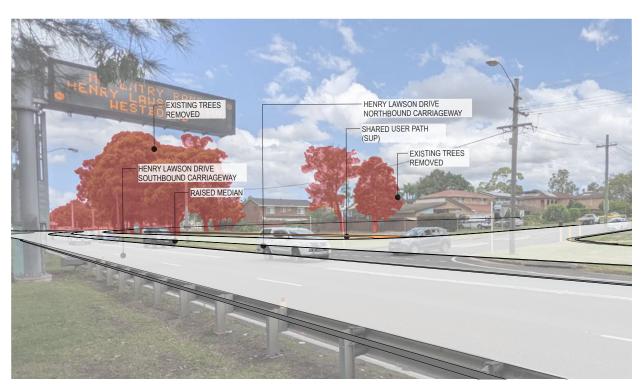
Viewpoint 3 - Existing view of Amiens Avenue and HLD intersection facing south east
